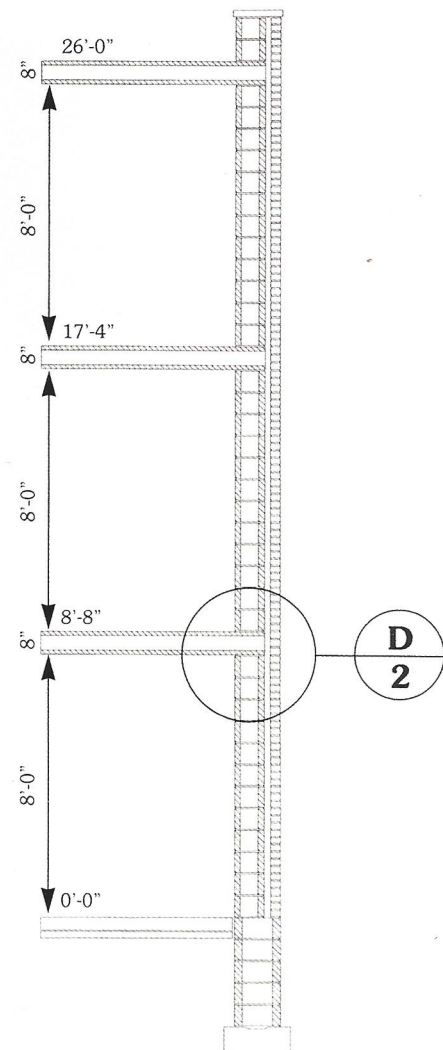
8" Precast Concrete Slab with Single Wythe CMU Wall
